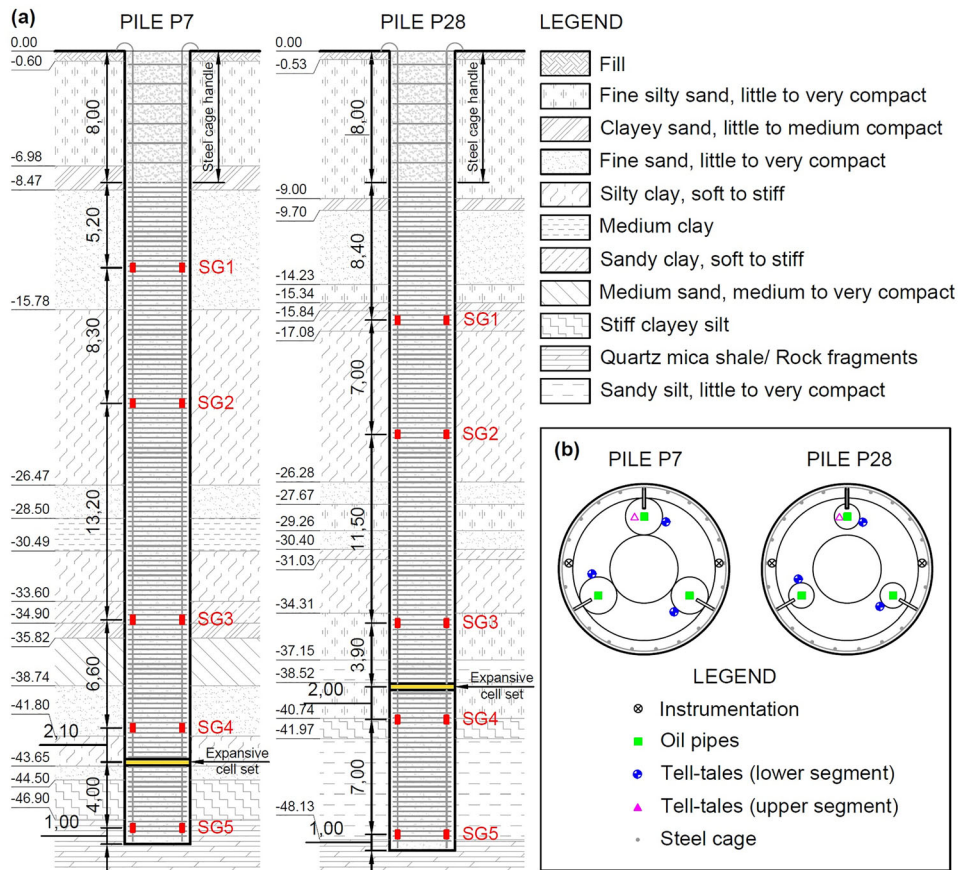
Schematics of details of piles P7 and P28: a soil layering and instrumentation profiles, and b details of cross-sectional area for each pile
